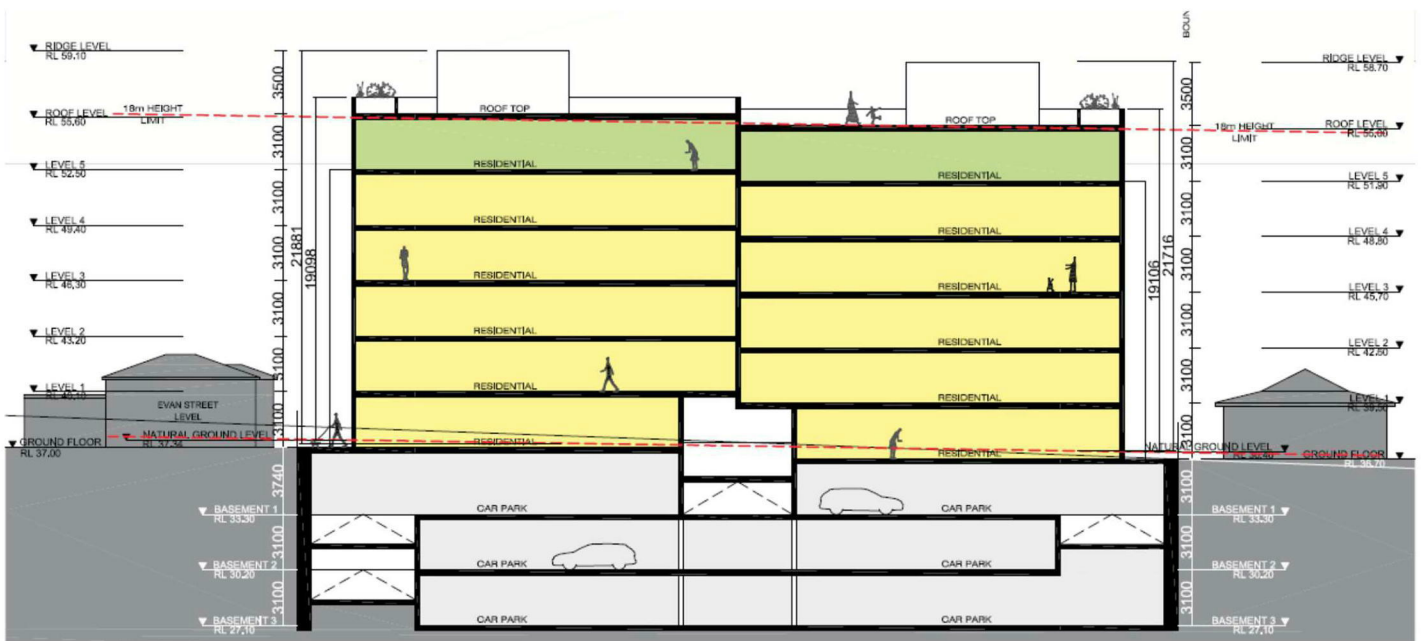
Section B demonstrating the proposal's varied maximum building height
